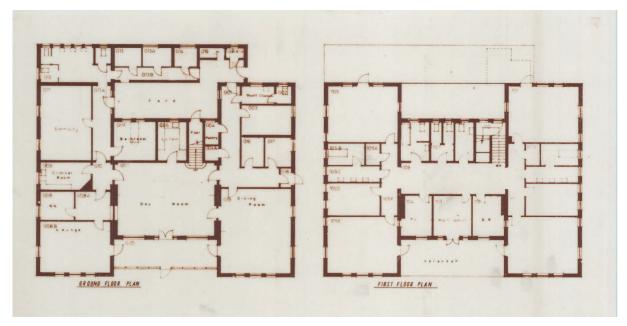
Buildings 47, 49, Lime & Willow historic ground plan
